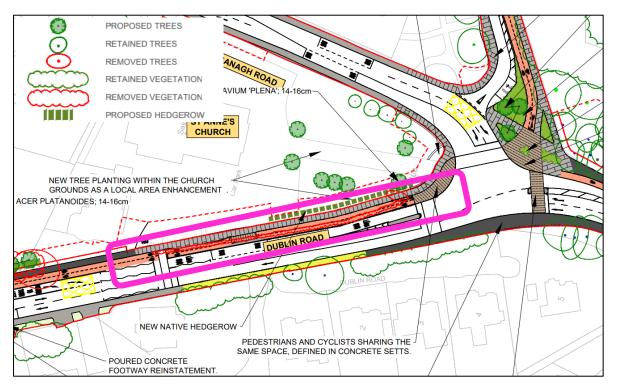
Extract from Landscaping General Arrangement Drawing (Sheet 43)
